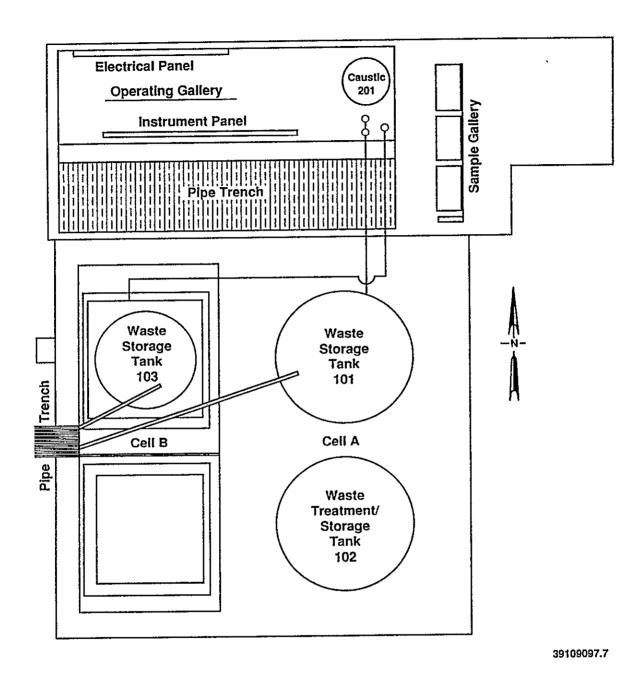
The 219-S Waste Handling Facility-Treatment and Storage Tanks.
